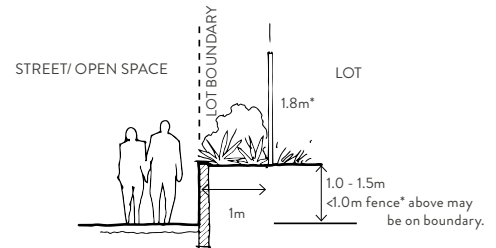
| Retaining Wall/ Side Fence: Secondary Street Interface
